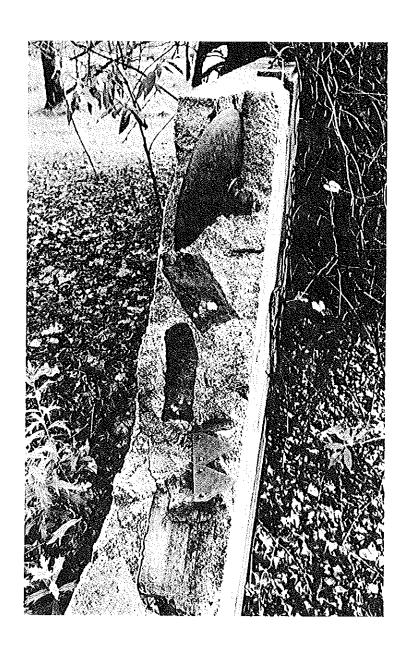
Wall profile at structure 1 or 14EW152 showing imbedded agricultural implements.
